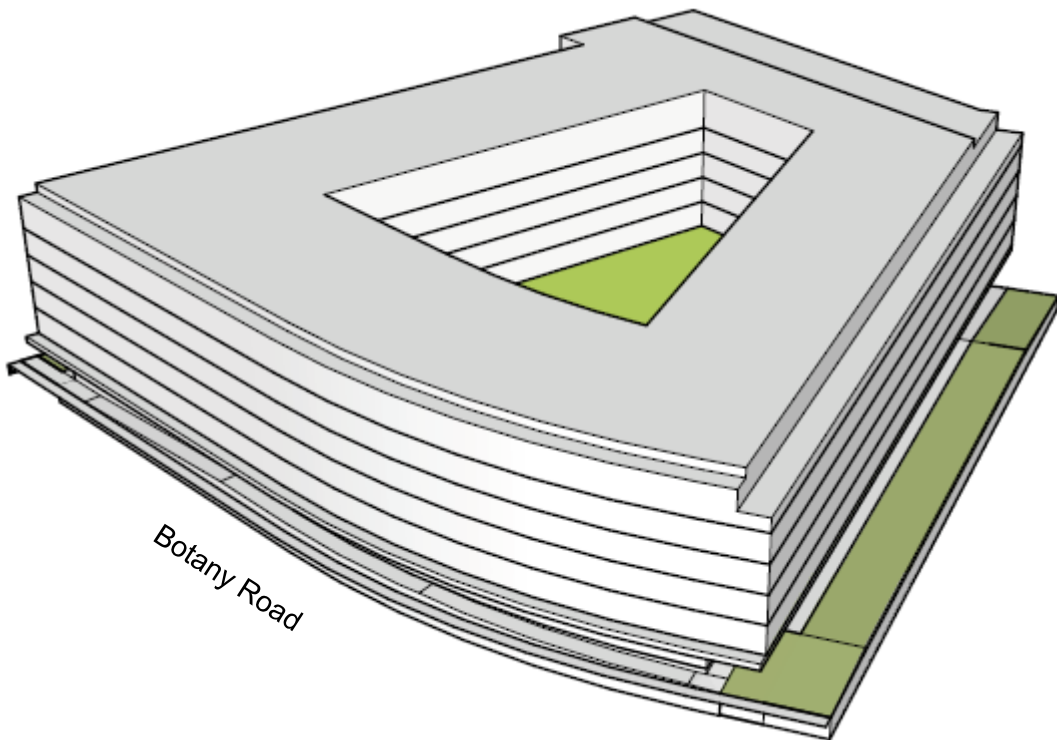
3D Massing of the proposal viewed from Botany Road and the northern elevation.
